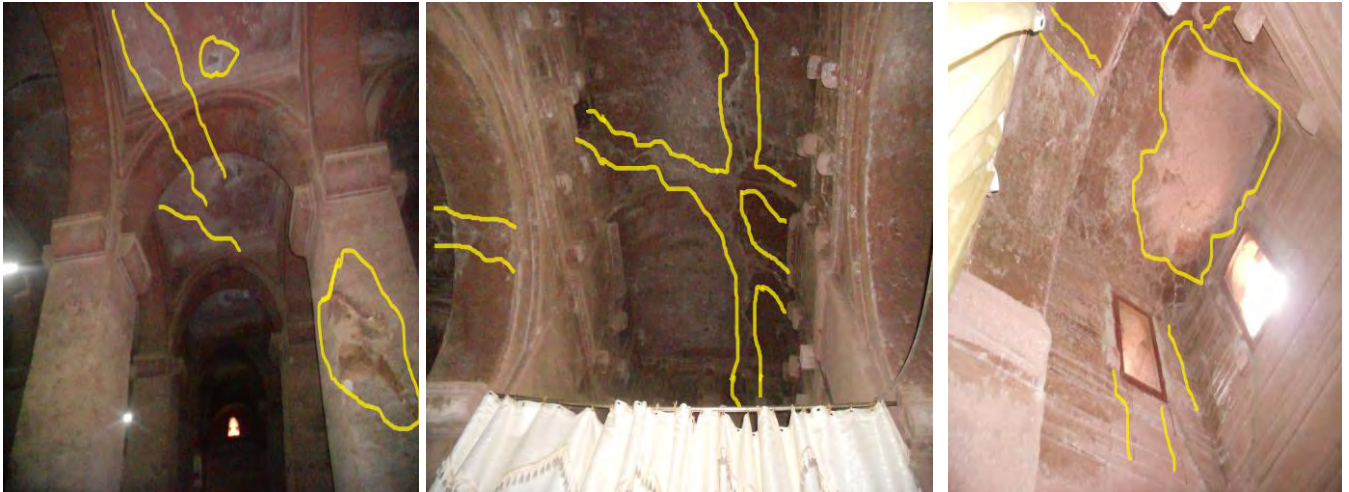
The Patten of cracks at Bete Amanuel (Internal), which shows continual cracks on the roof to the wall and deterioration.
